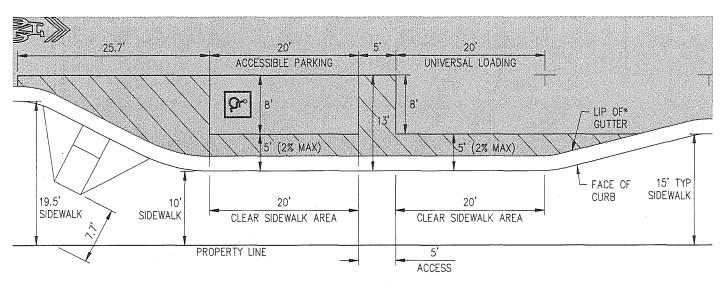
Universal Passenger Loading Zone and Accessible Parking Stall
